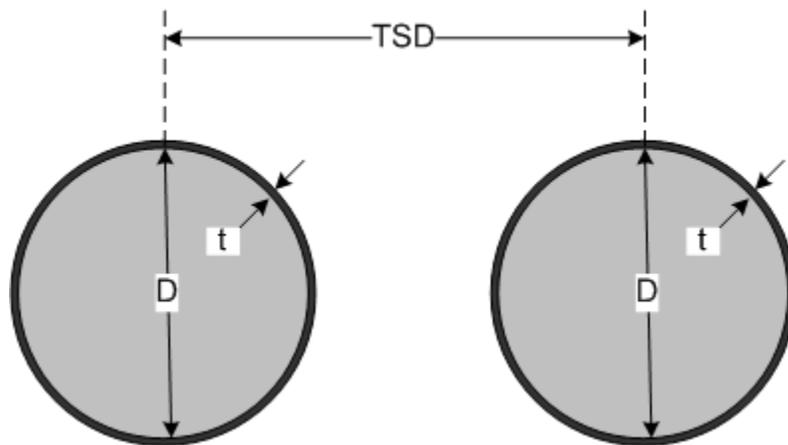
Spacing distance between concrete-filled tubes.
